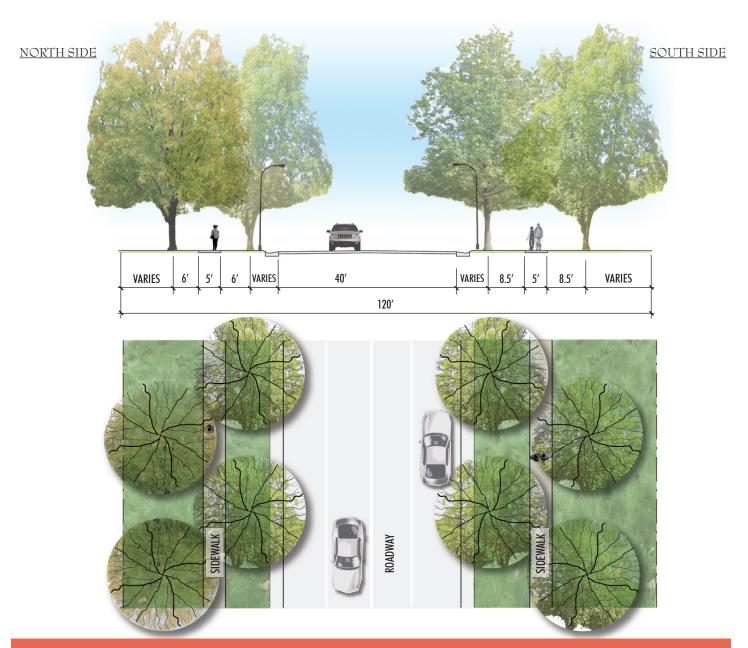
Eastern Parkway: Zone 5 Existing Conditions Section and Plan
